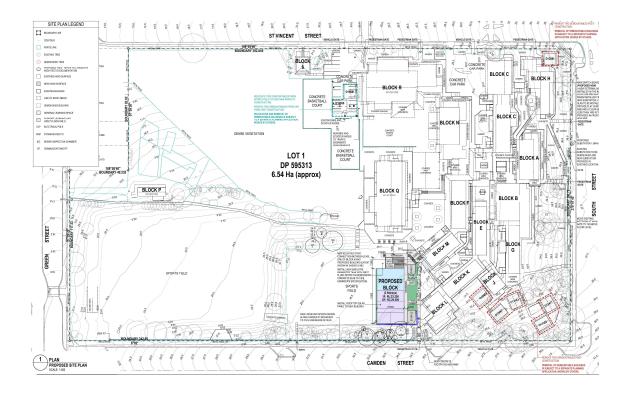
Site Plan (Source: Fulton Trotter, 2025)
